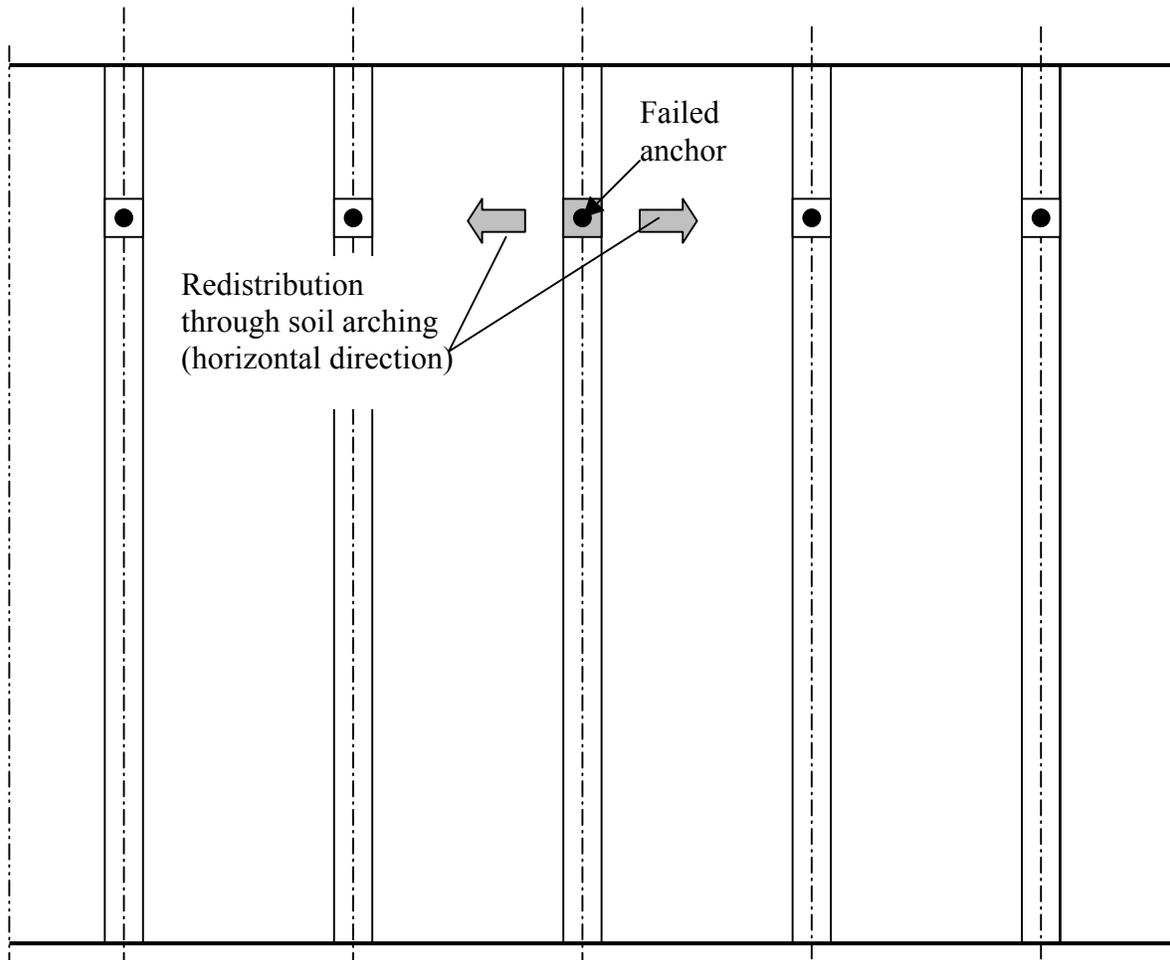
Failure conditions to be considered in design of anchored walls (after Figure 11, FHWA-SA-99-015)
